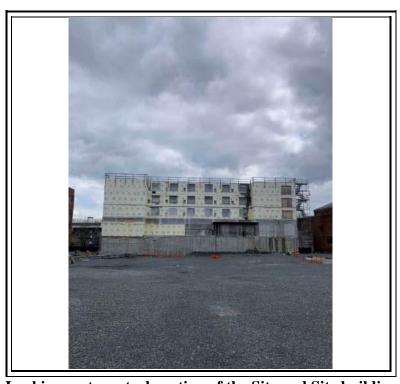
Looking east; central portion of the Site and Site building. (04/08/22)
